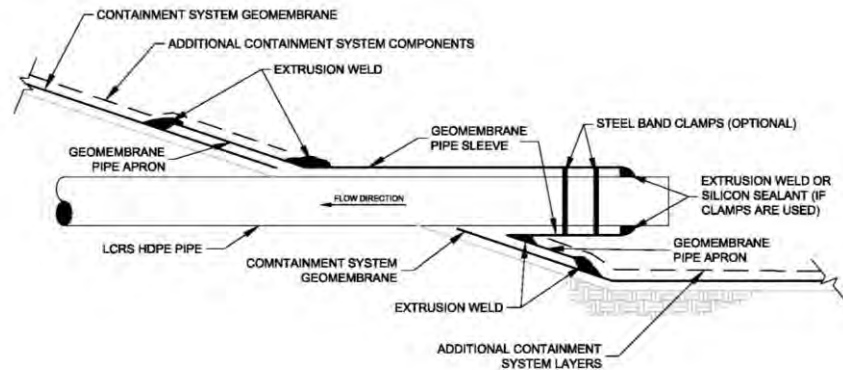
Typical pipe boot detail for single-containment landfill cell.
